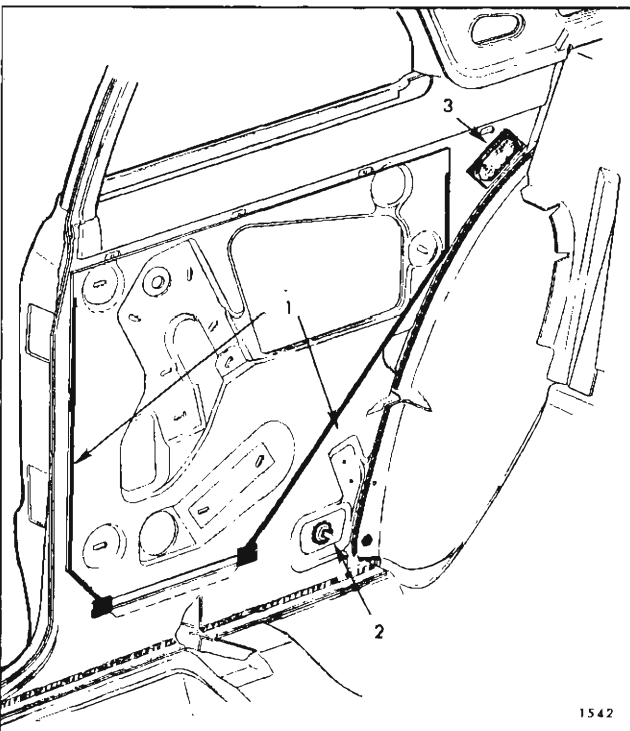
E10—Rear Quarter Inner Panel Sealing - "11" Style
